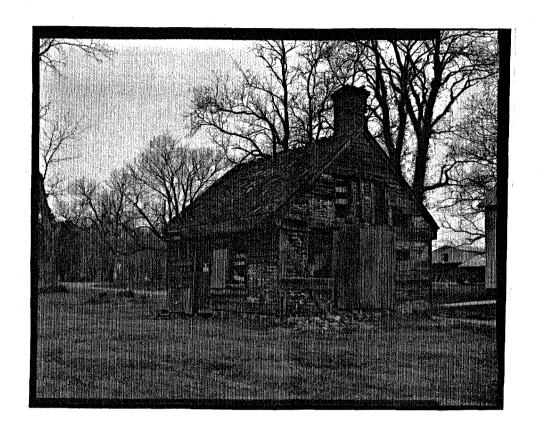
Hermitage Quarter, perspective of south and west elevations looking northeast.
